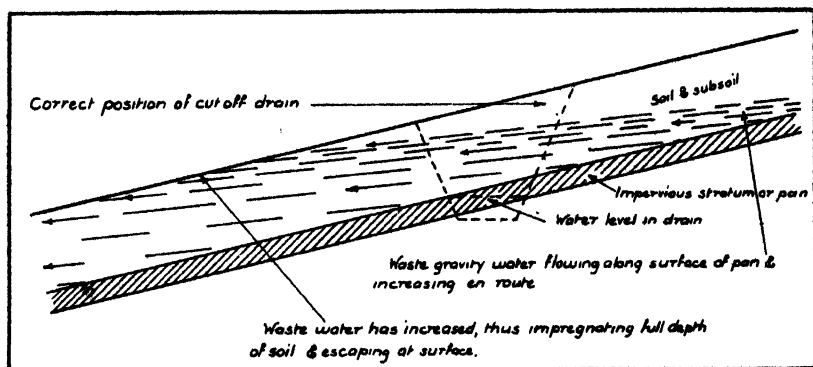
SKETCH SHOWING METHOD OF CUTTING OFF SUB-DRAINAGE FROM UNDERGROUND IMPERVIOUS STRATUM ON SLOPE.
